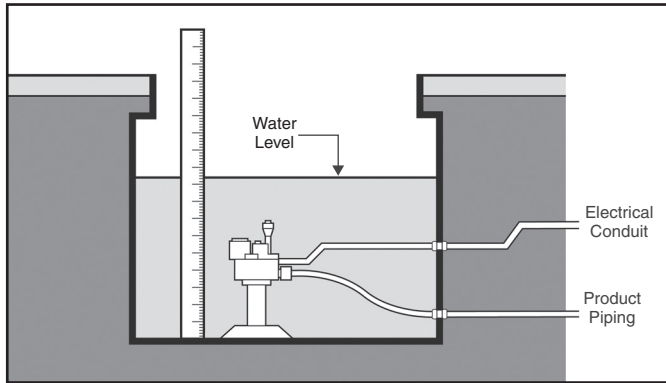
The test fluid level in the under dispenser containment (UDC) must be at least 4 inches above the highest sump penetration or sidewall seam.
